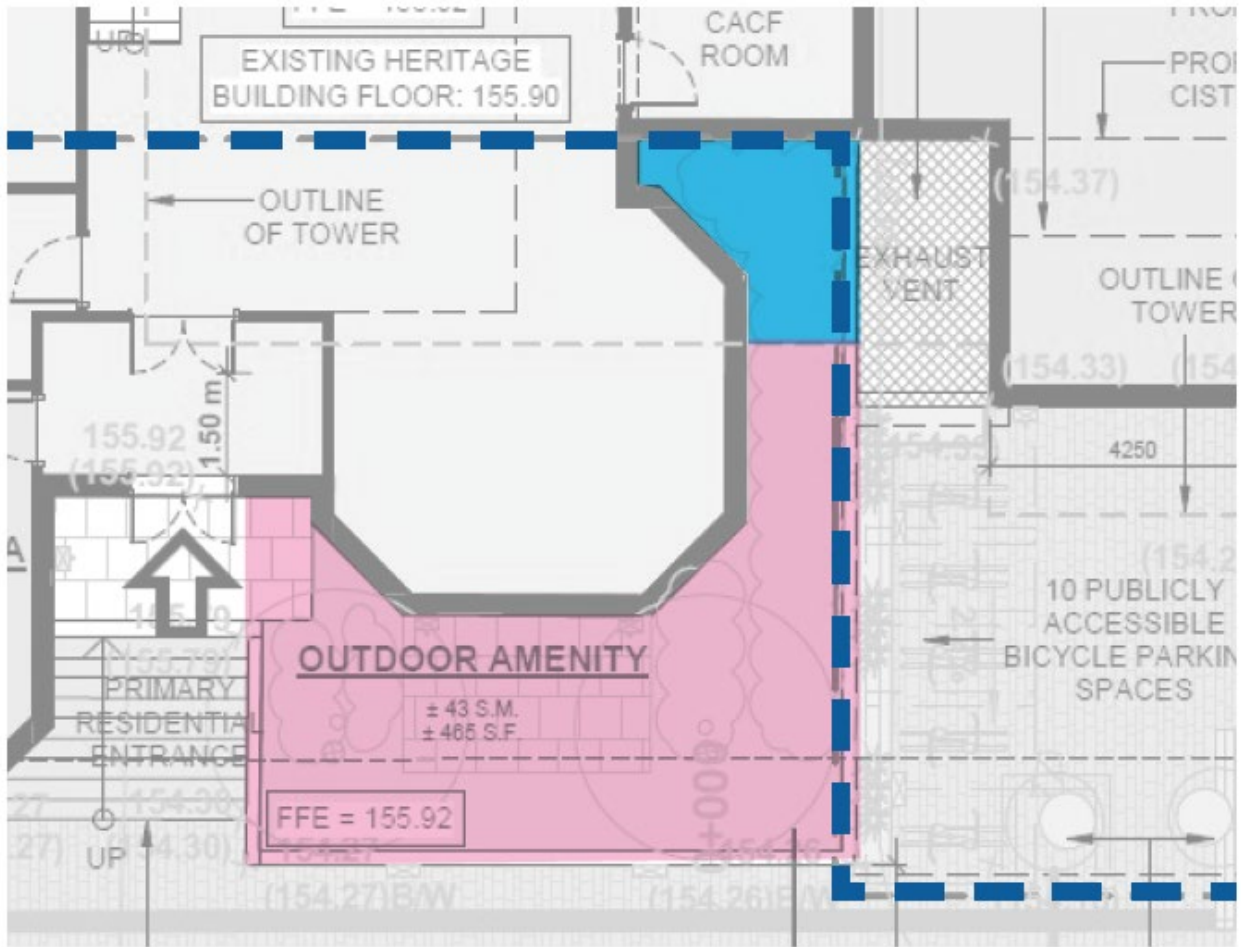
Proposed ground floor plan, showing reconstructed terrace in pink, terrace extension in blue, and the southern extent of the underground parking area as a dotted blue line (Turner Fleischer, 2025; annotated by ERA).
